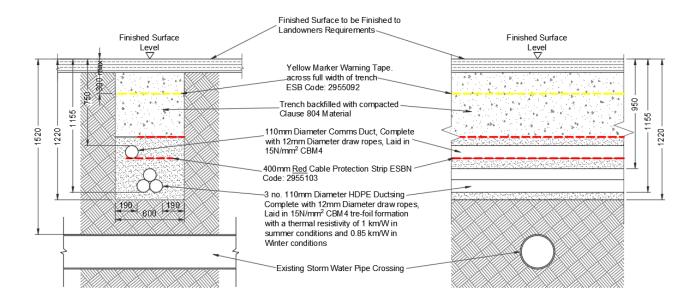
Piped Culvert Crossing – Ducting Over Culvert Crossing Details
